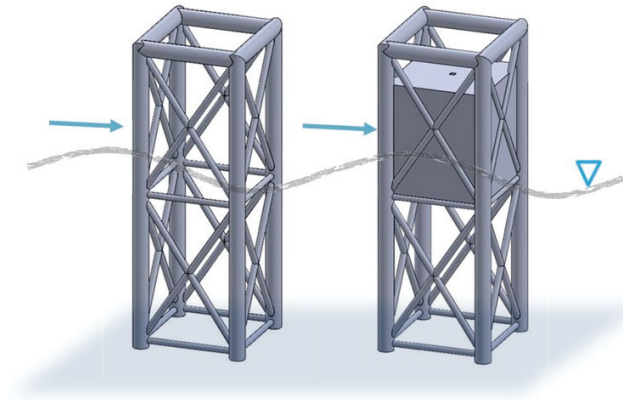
Schematic drawing of a jacket type structure installed with OWC converter.
